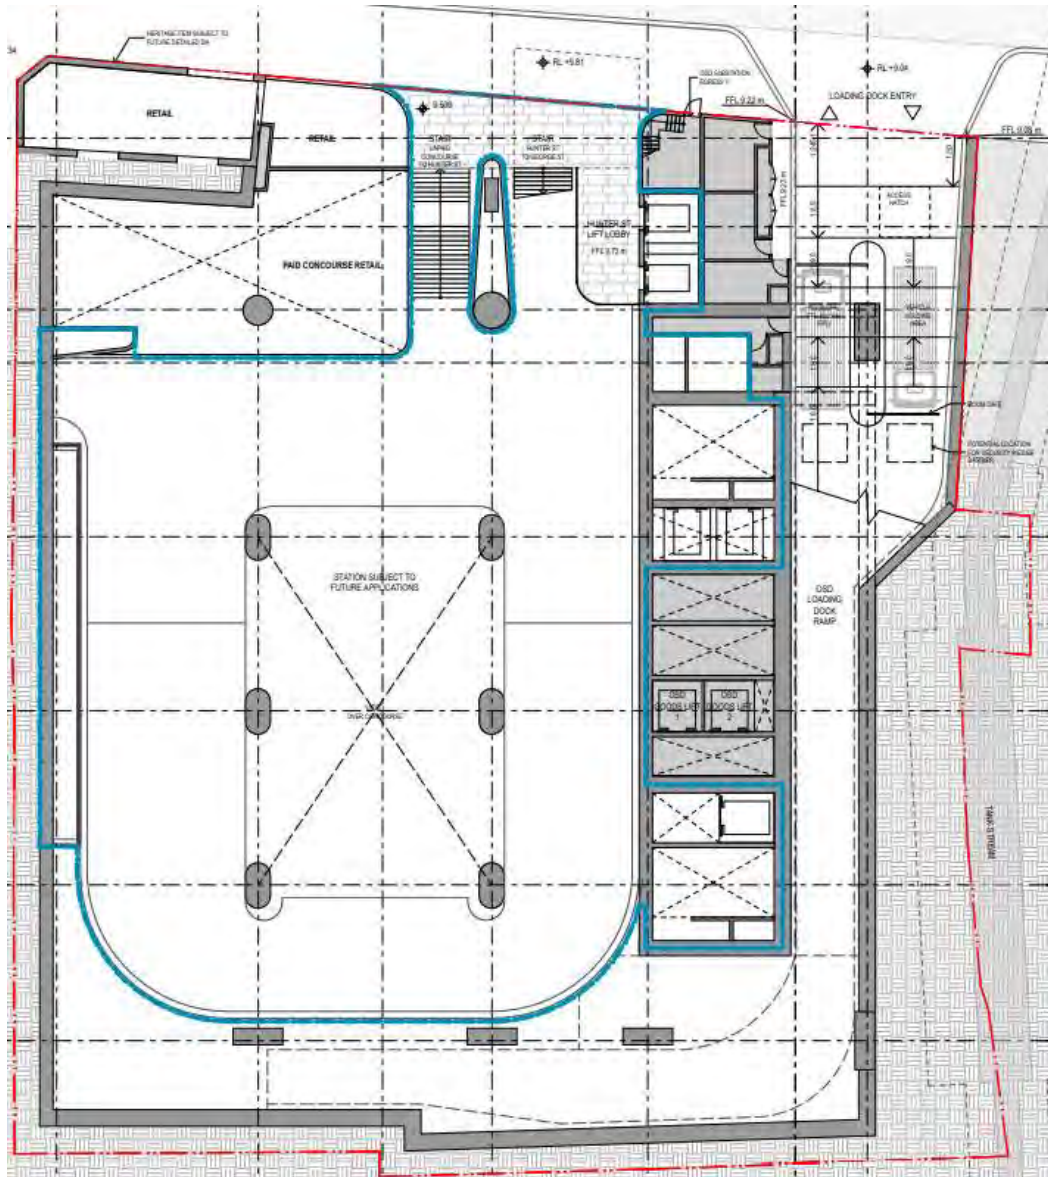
West Hunter St Station and OSD ingress locations at Hunter Street
